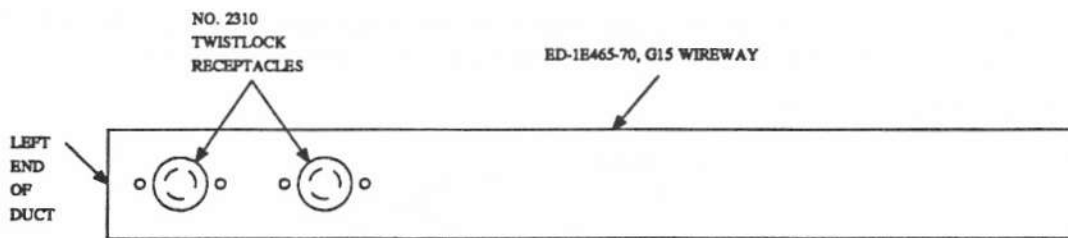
Bottom view of ED-1E465-70, G15 Wireway
